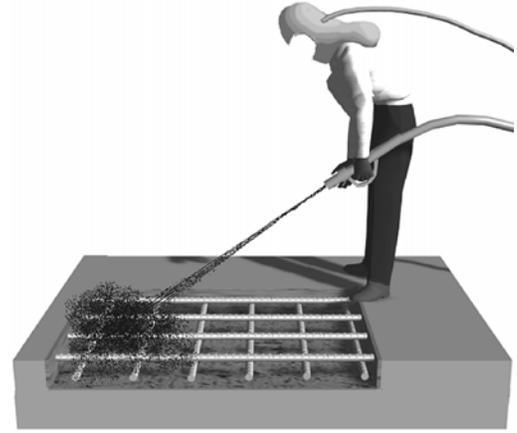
Clean the exposed concrete and reinforcing bars with high-pressure water or abrasive blasting.
